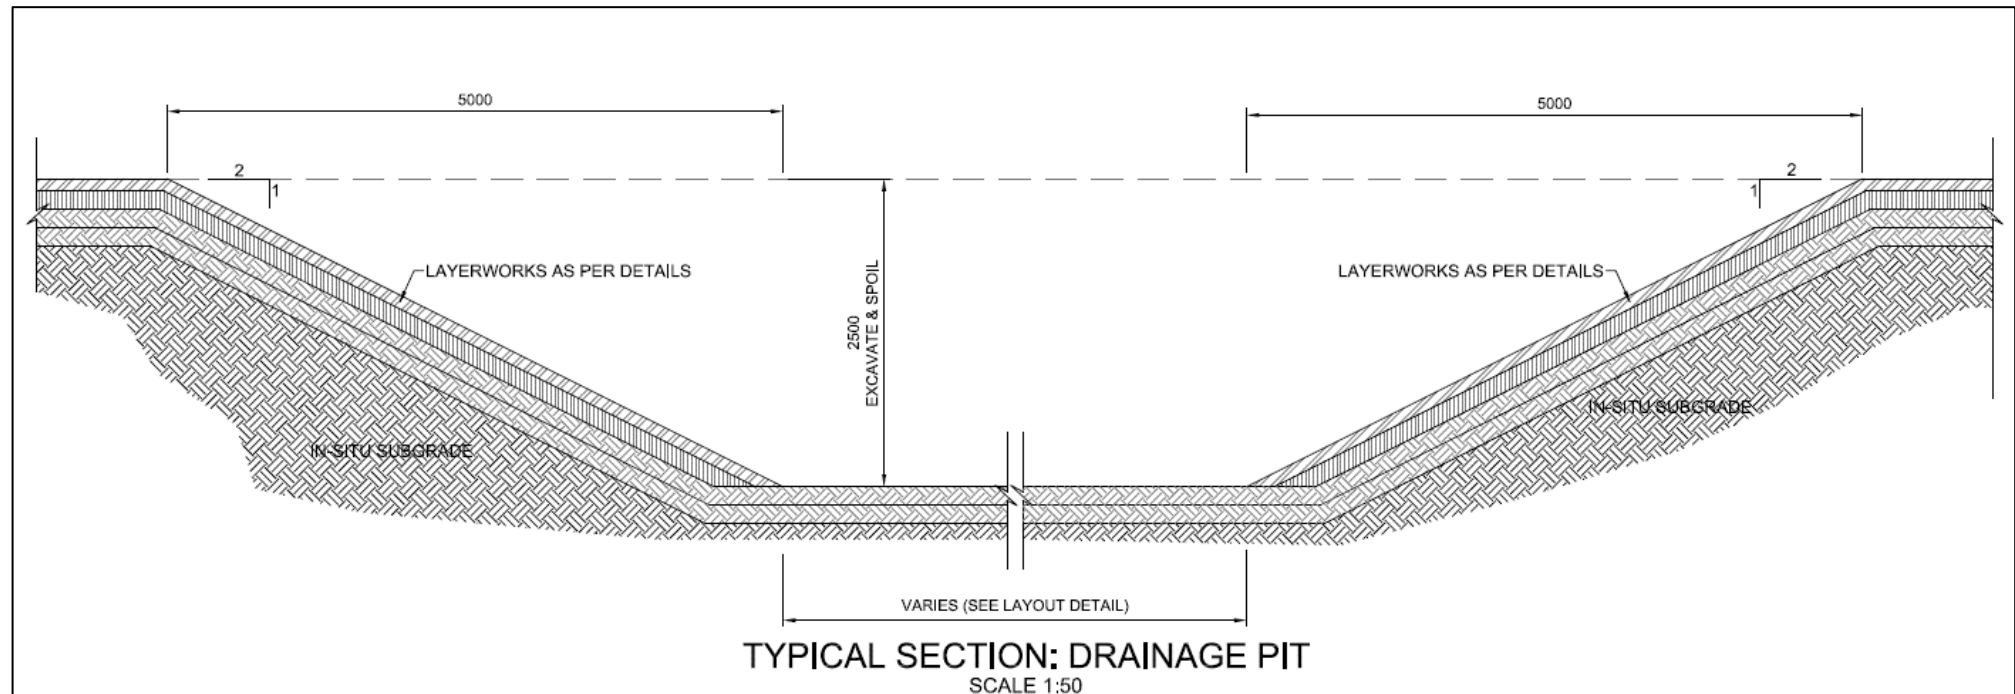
Drainage / reserve pit site engineering design example (Source: Preliminary Drawings by Burmeister & Partners for REN, 2022).
